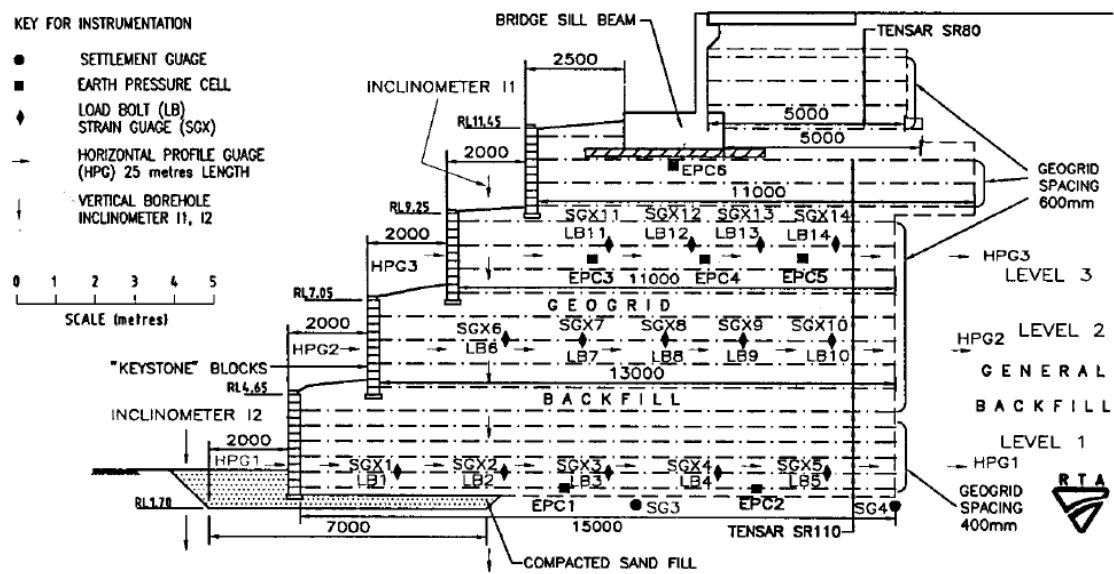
New South Wales Bridge abutment cross-section (Won et al. 1994).
